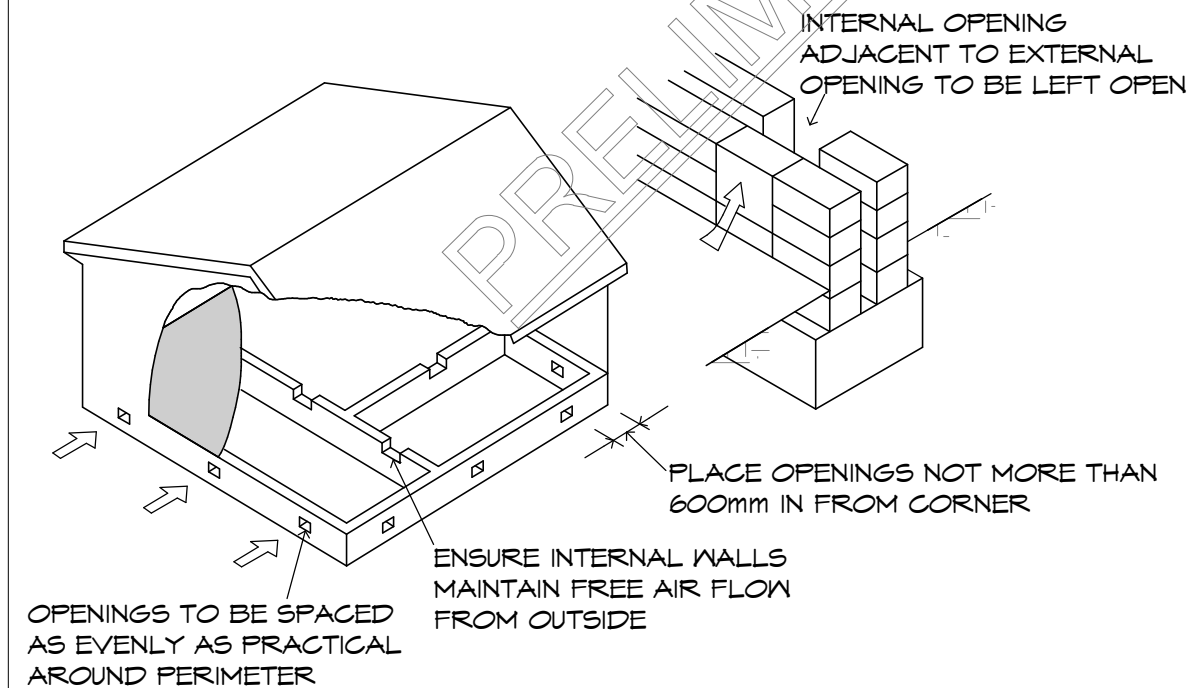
TYPICAL SUB-FLOOR VENTILATION DETAILS - TYPICAL CROSS VENTILATION OF SUBFLOOR AREA
